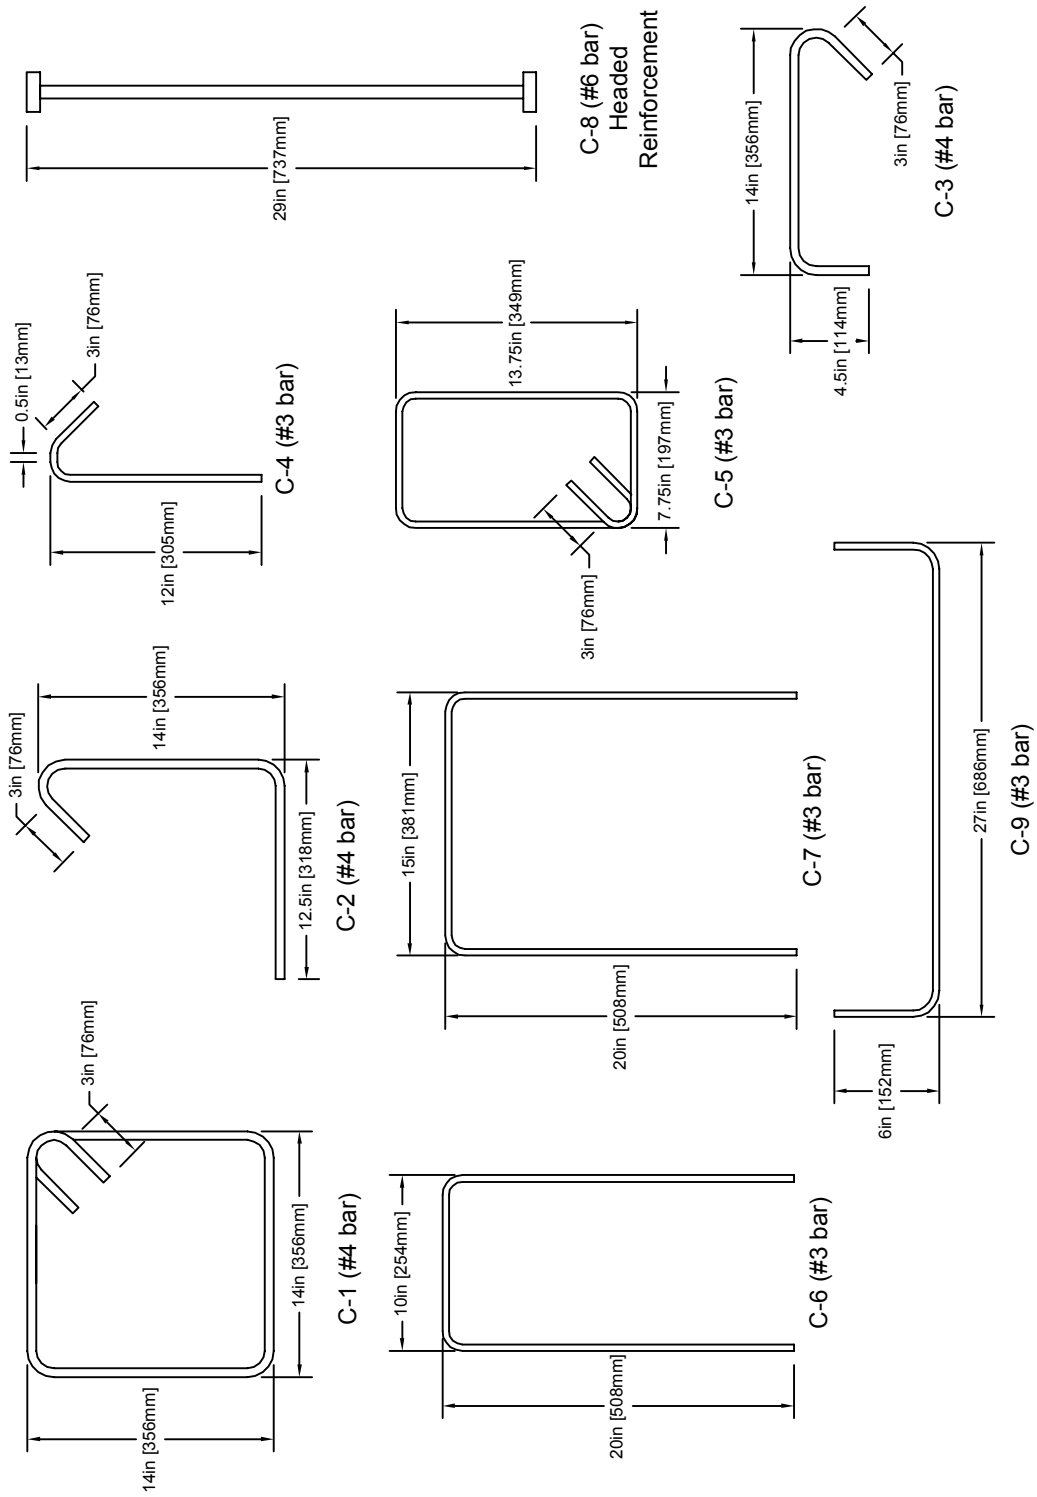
Bridge Plans Sheet 19; Steel Details 1.
